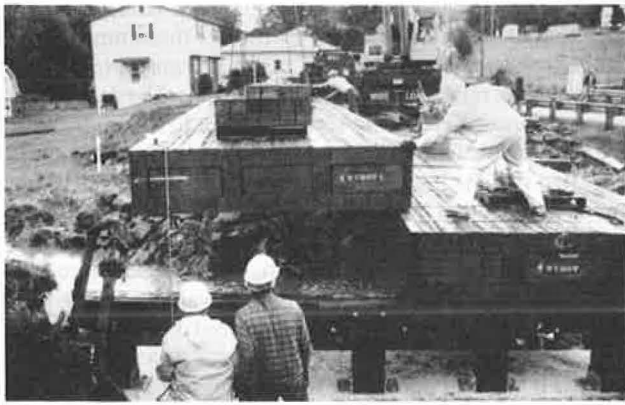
Prefabricated, stressed, boxed-girder bridge panels being lifted onto abutments at Field Crest Bridge, Morgantown, West Virginia.
